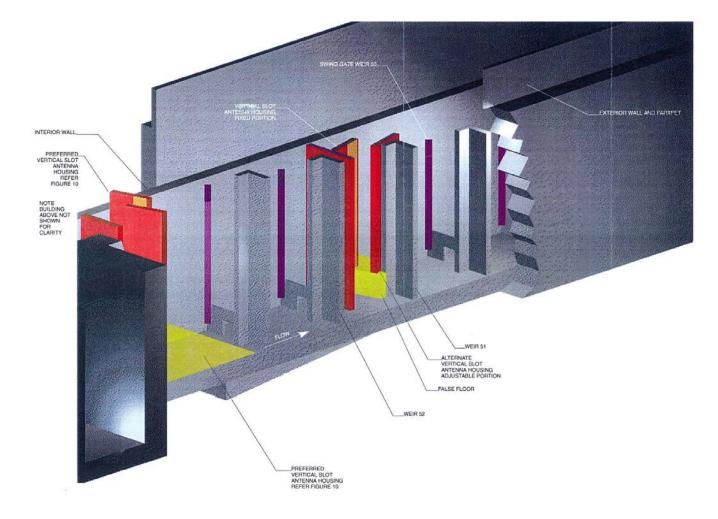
Antenna Housing Installation - Looking through Wall into Pool 51 from Southeast
